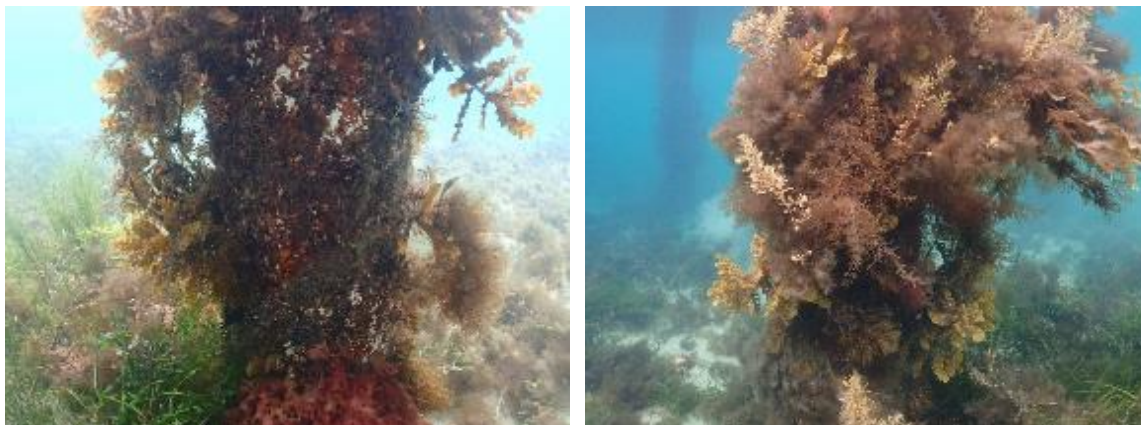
Outer steel pile (pile 33) facing inward (left) and outward (right) Flinders pier, 2020
